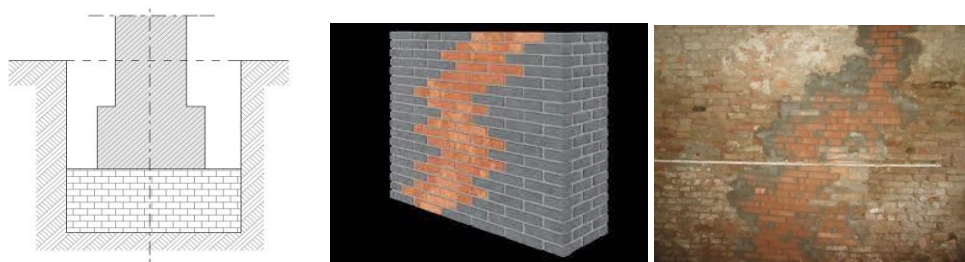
Interventions at the foundations, by extending the existing dimensions.; Removing and rebuilding the masonry with *cuci e scucci* technique.
